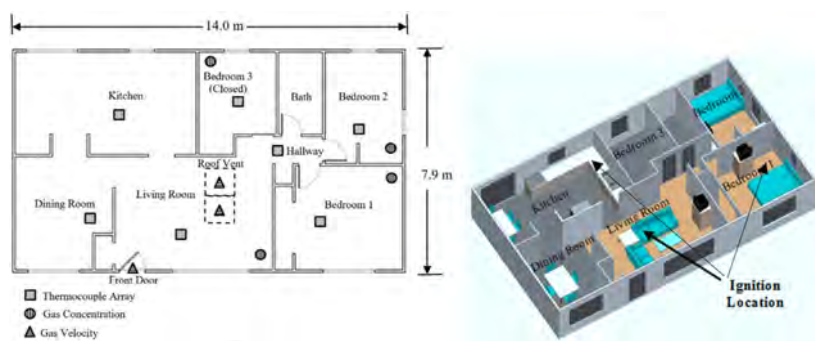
One-story house floor plan and 3D rendering showing furniture and ignition location.
